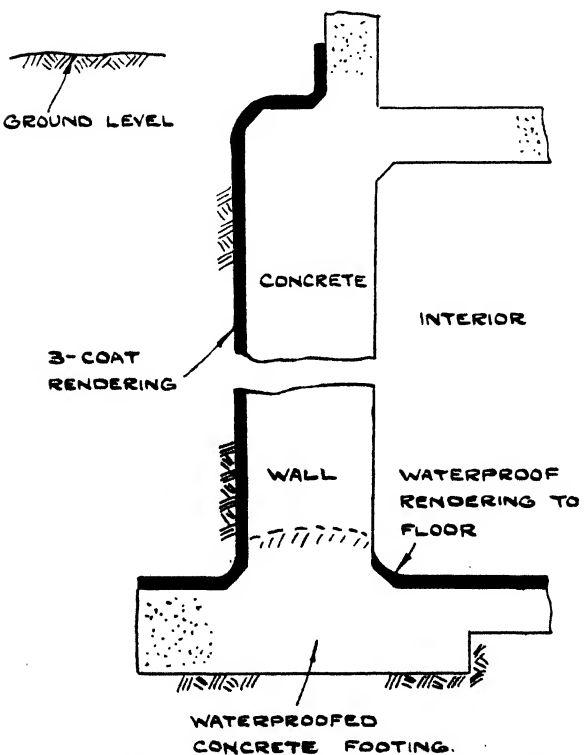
A METHOD OF WATERPROOFING A NEW CONCRETE BASEMENT, USING EXTERNAL RENDERING TO WALLS
